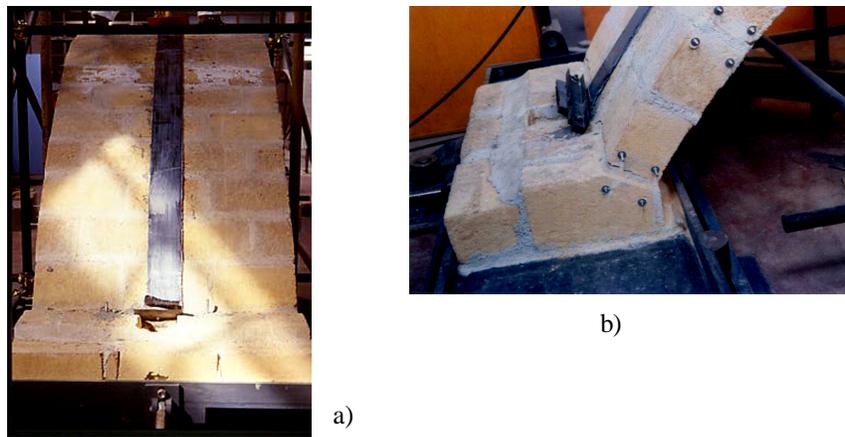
CFRP reinforced vault: a) global view; b) particular of anchorage with steel slab.
